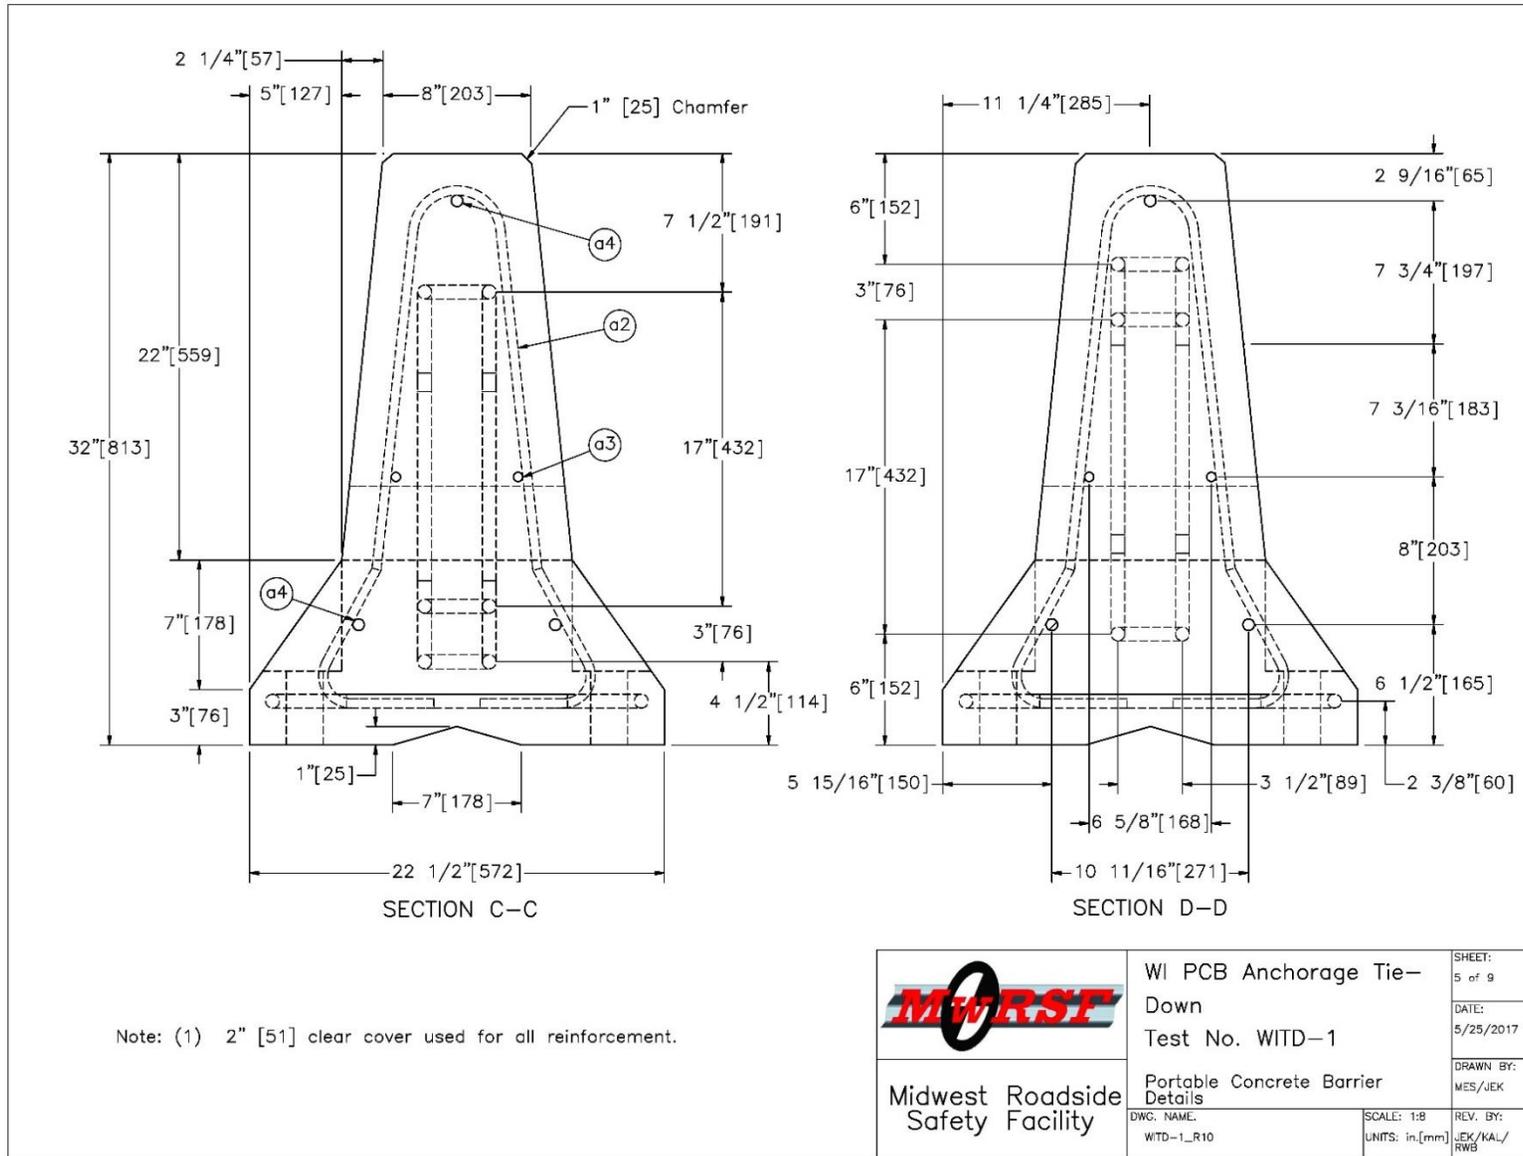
Portable Concrete Barrier Details, Test No. WITD-1
